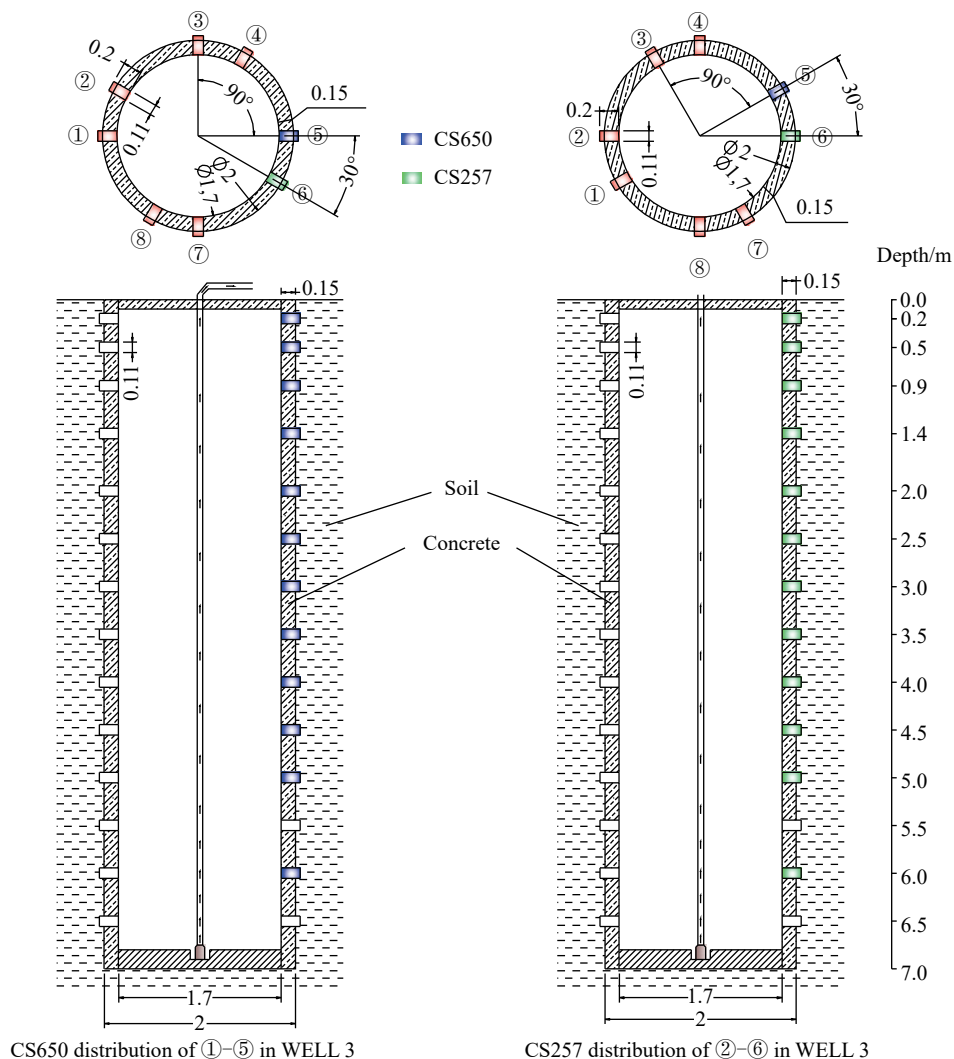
Equipment layout plan of monitoring profile in WELL 3.
